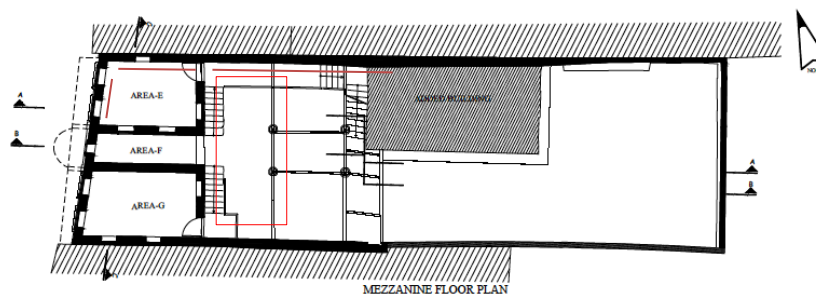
Adana-Tepebağ case study house mezzanine floor plan [1].
